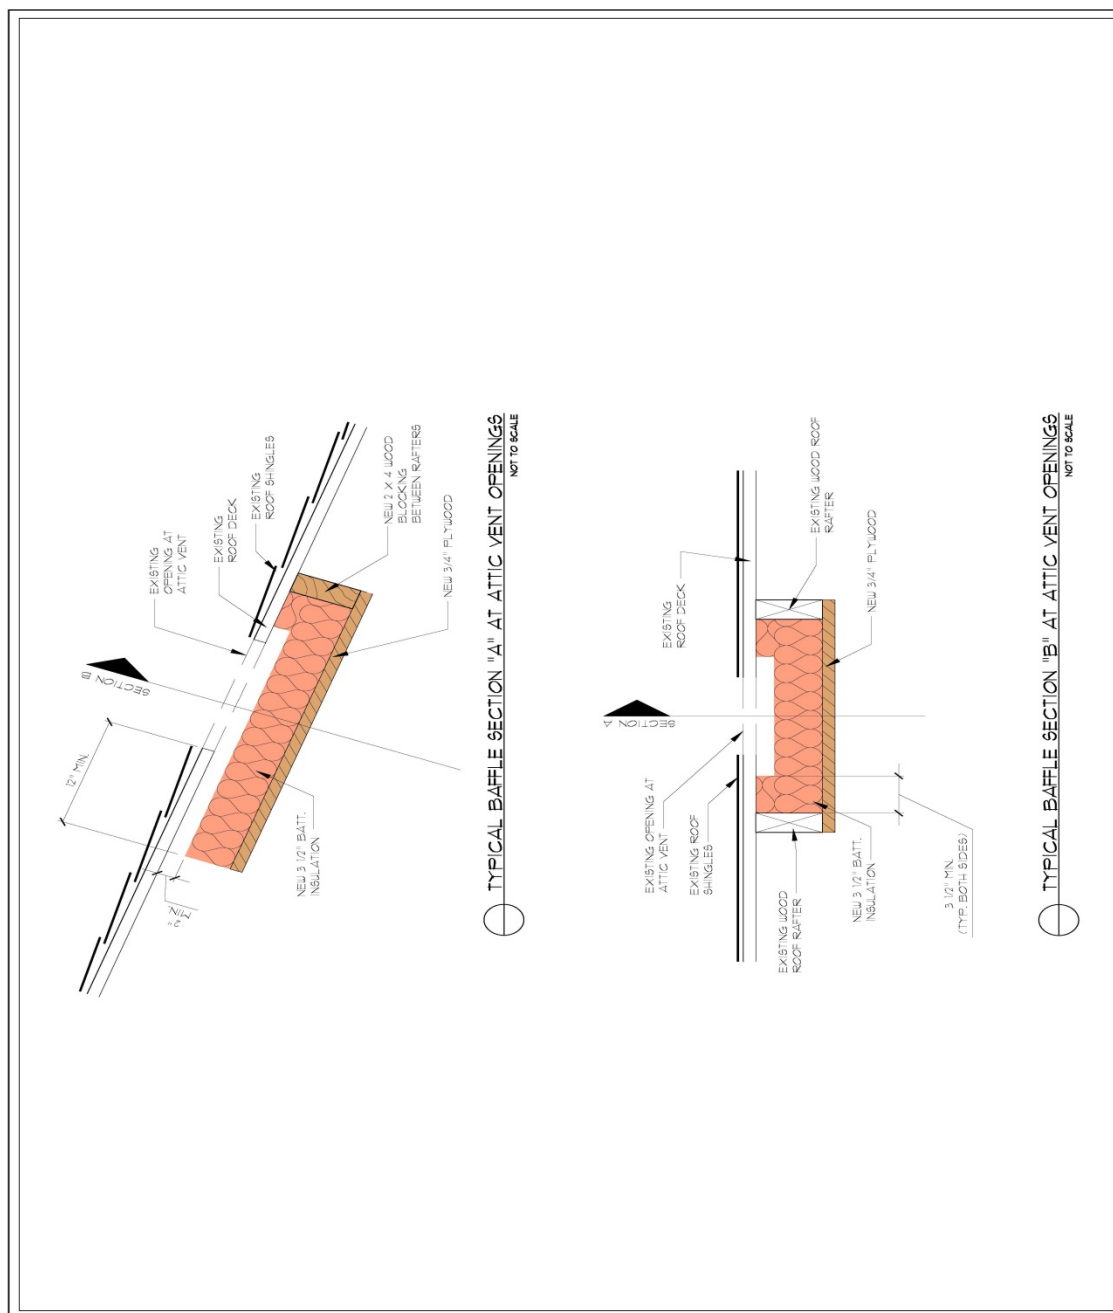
Typical Baffle Detail at Attic Vent Openings
